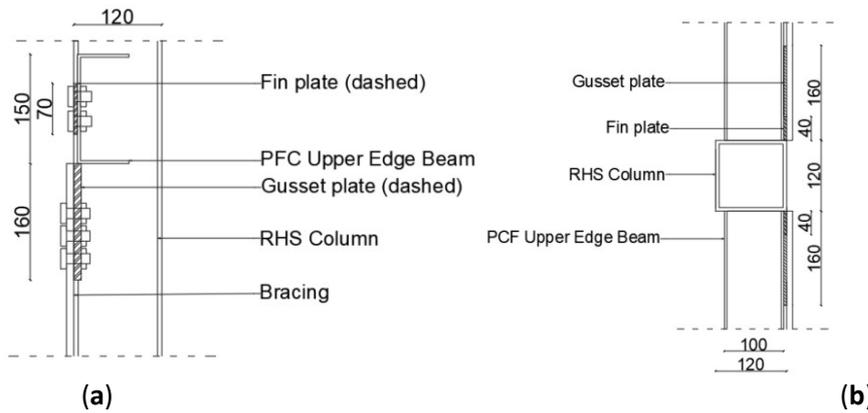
Connections of fin plate and bracing to column: (a) Cross-section, (b) Top view (own work).
